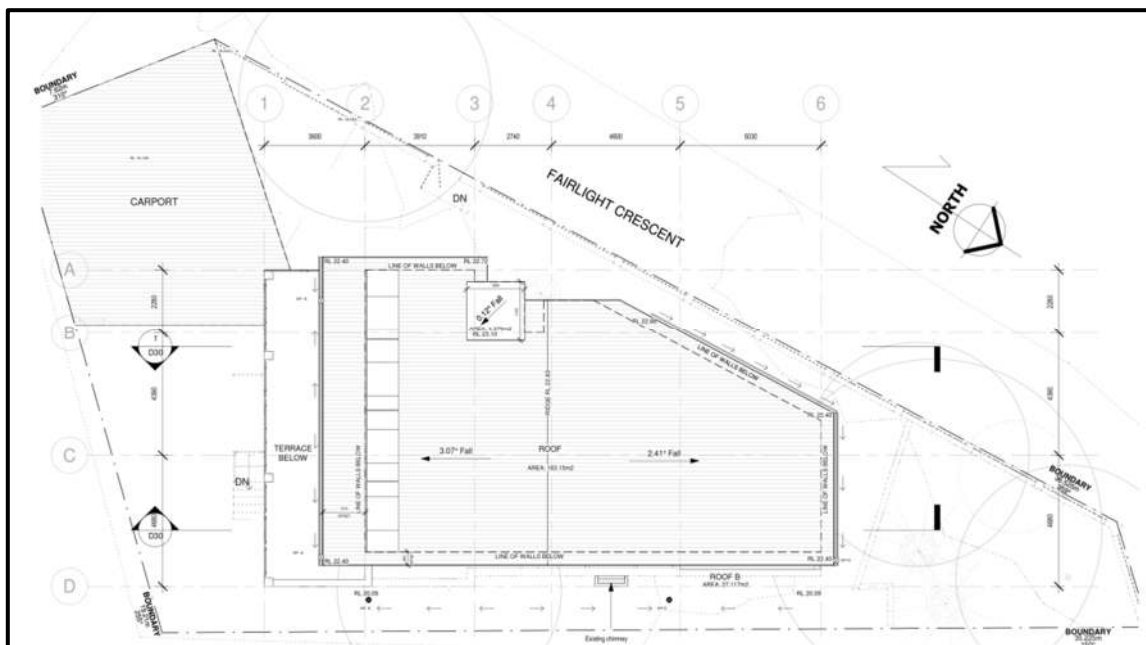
Roof Plan (Source: Woodhouse & Danks, June 2023)
